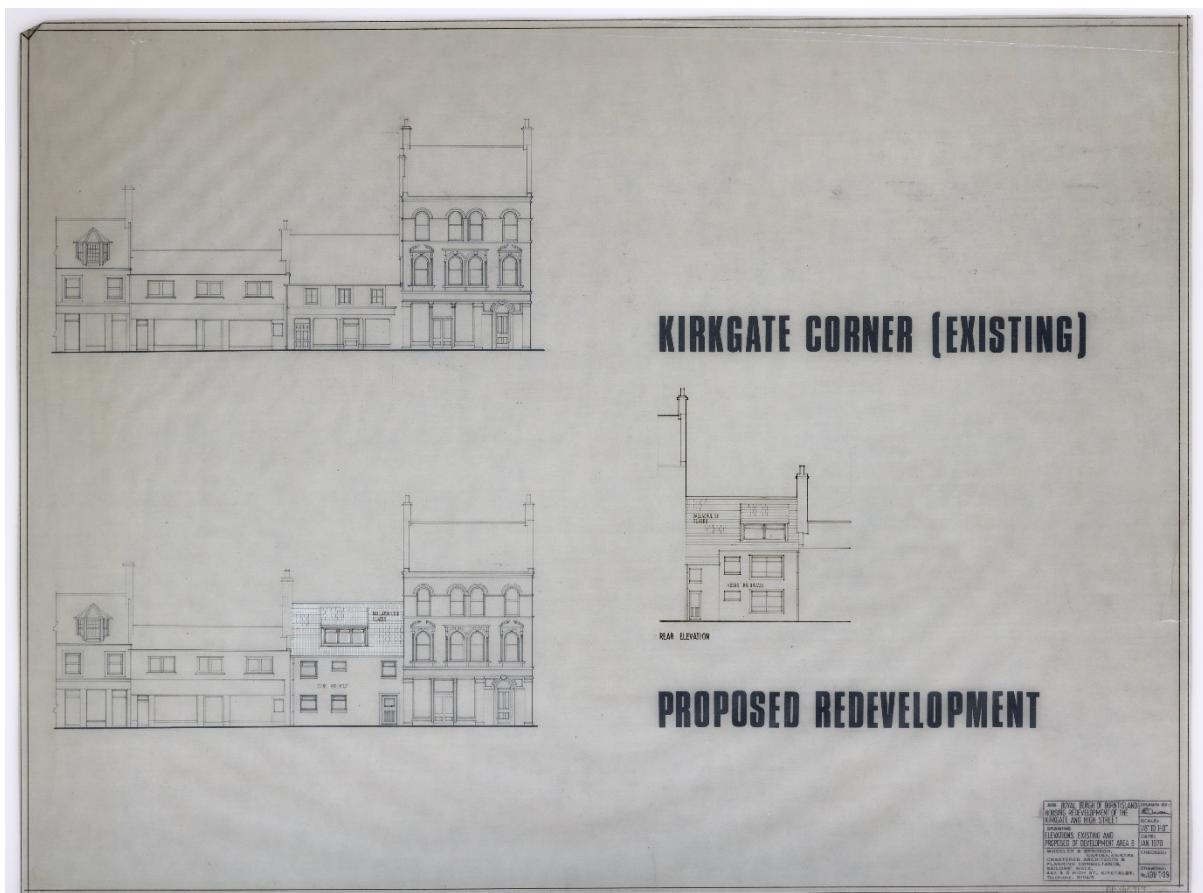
'Elevations Existing and Proposed' of Kirkgate/ High Street (Job 491) High Street block, January 1970.
